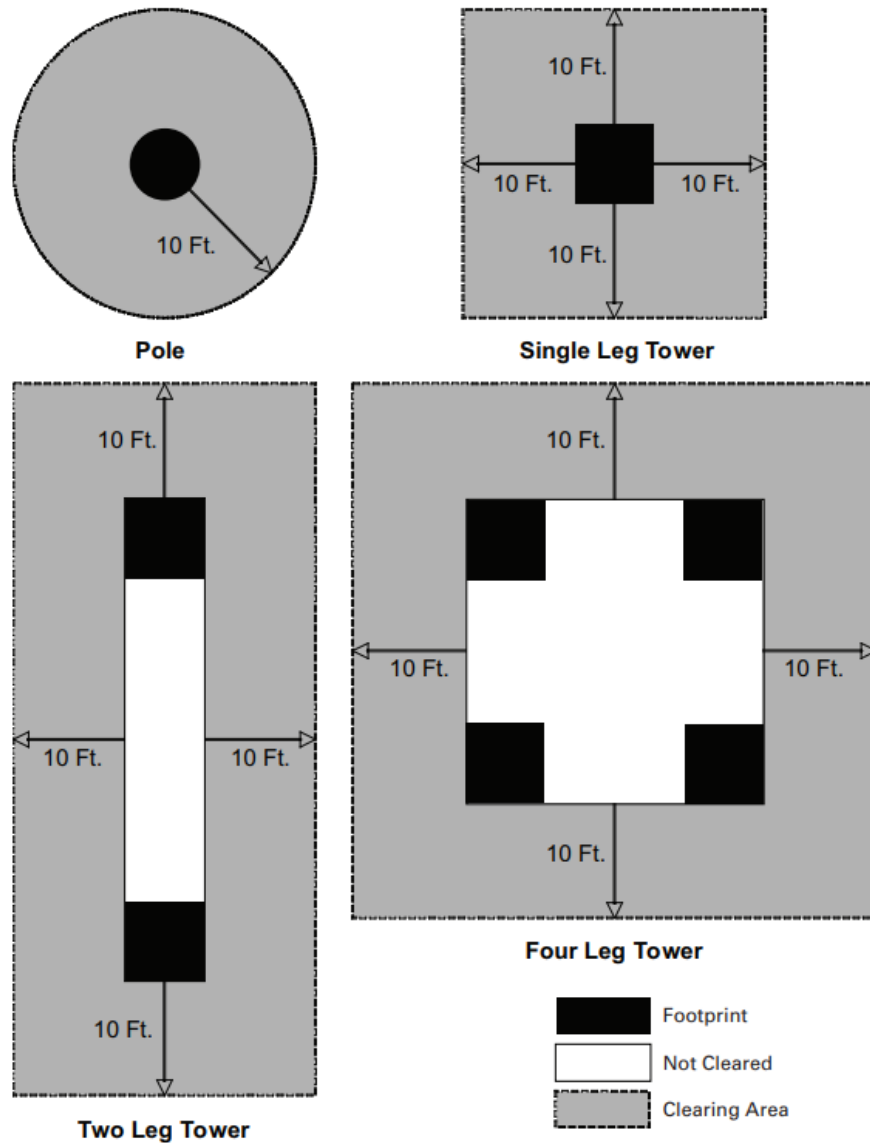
Firebreak Examples (Plan View at Ground Level)³
